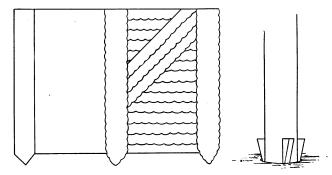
Detail of Decorative Sago Bark Shingling on Arapesh House. Front of Balidu's Big House, Alitoa Village Plan, No. 33 (Fig. 25).
